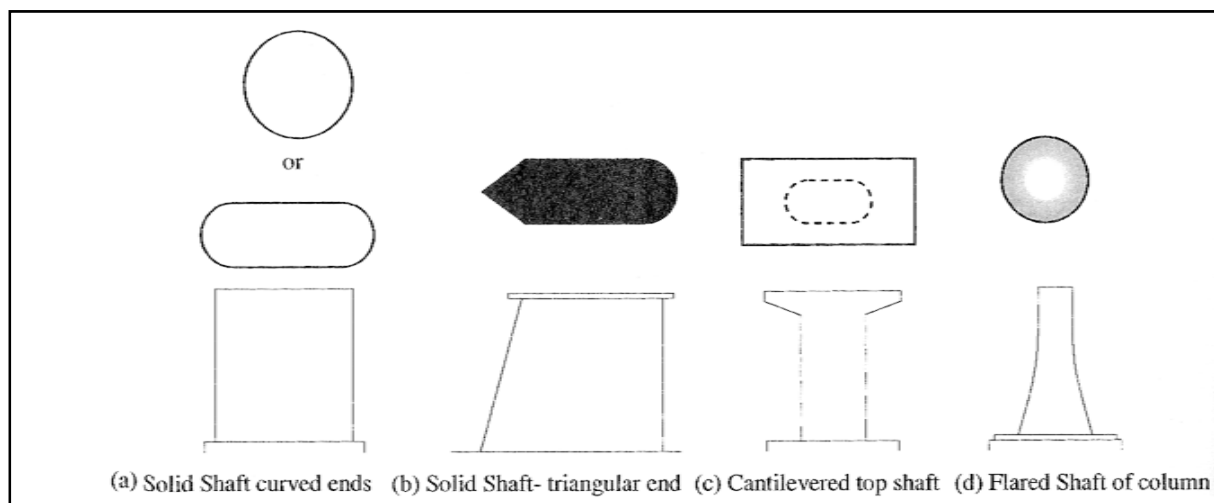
Types of bridge piers (Troitsky 1994)
